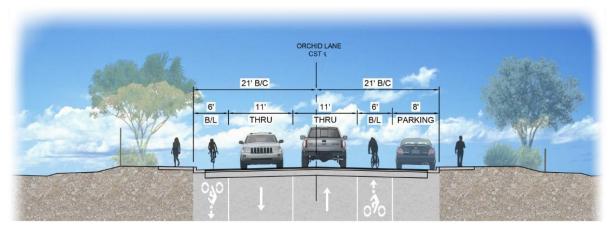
Orchid Lane Typical Section - Segment H3 Standard Bike Lanes/South Side Parking
